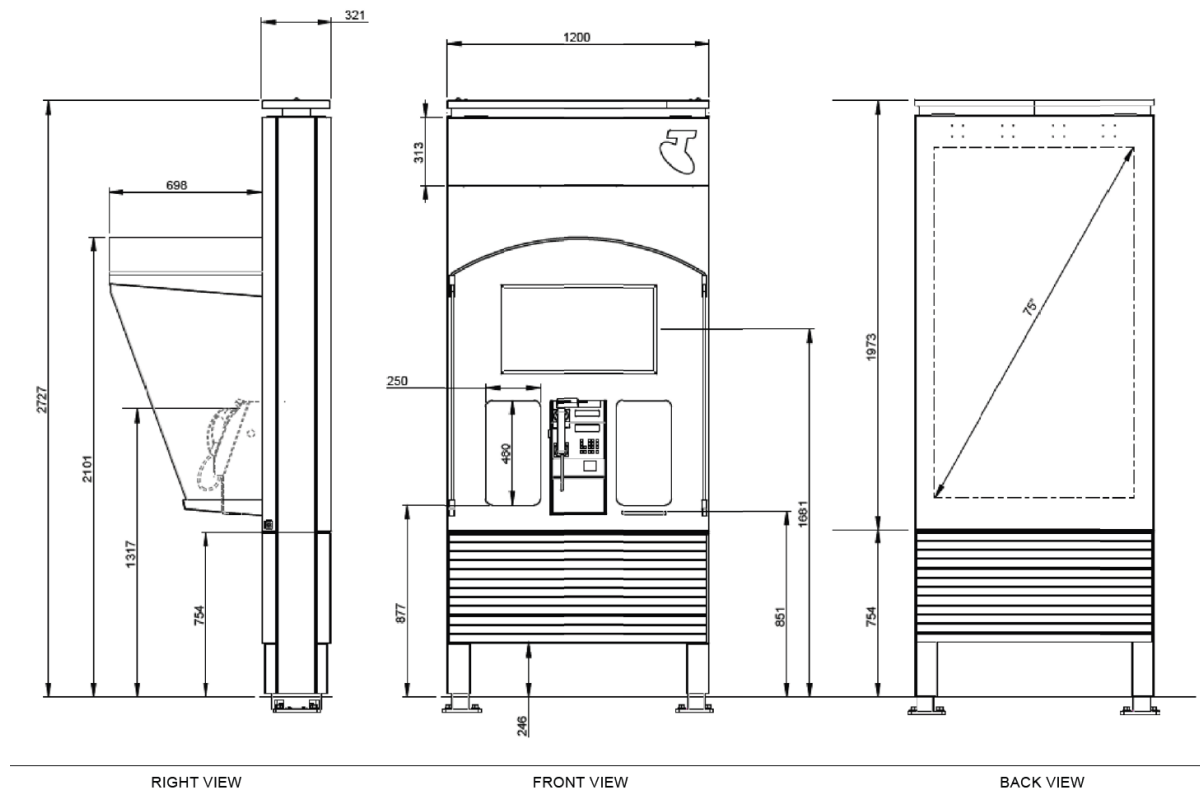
elevation plans of the proposed payphone structure (*Source: Applicant*)
